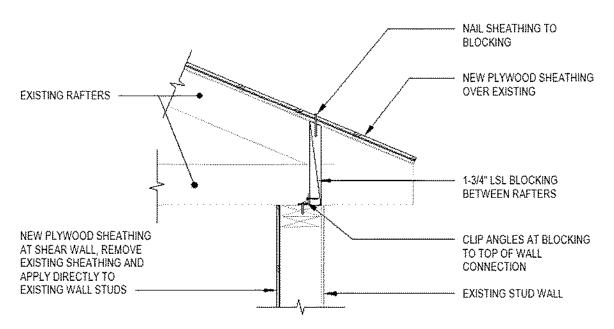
Connection at Diaphragm to Top of Shear Wall
